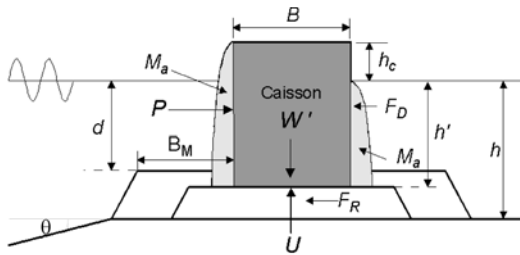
Typical cross-section of vertical breakwater and forces acting on caisson during sliding.
